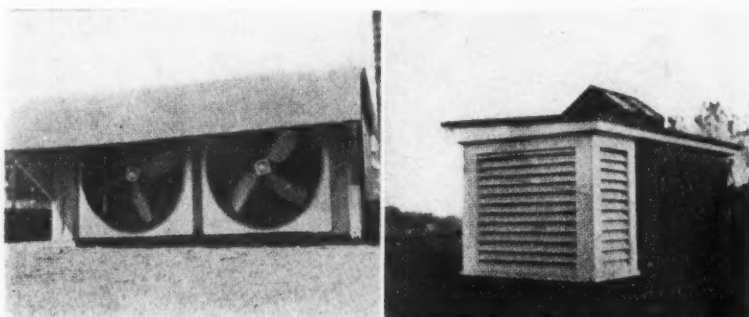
(left)—A hooded penthouse twin fan installation. Fig. 9 (right)—A louvred penthouse built of wood. One louvre should be removable for access to fan. (Both photos from Hunter Fan & Ventilating Co.)
